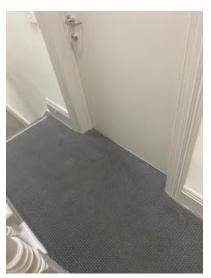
Bedroom doorway (1 of 2) in upper hallway
